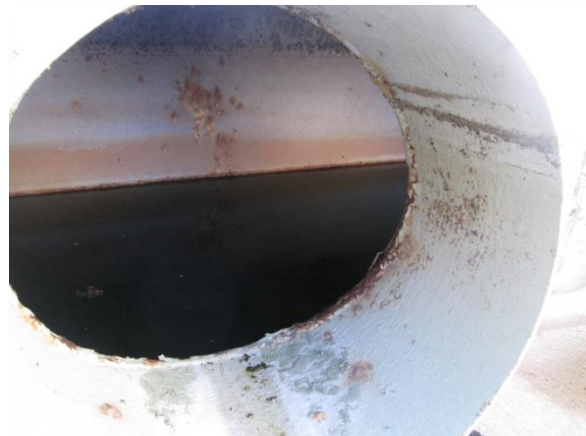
Steel manifold pipe with minor coating failure and corrosion.
